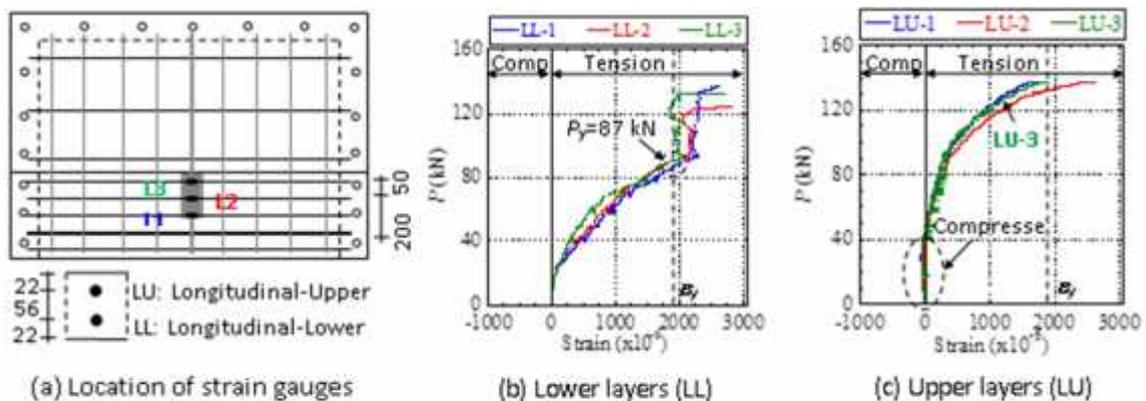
Strain in the longitudinal rebars (SL-P1.0).
